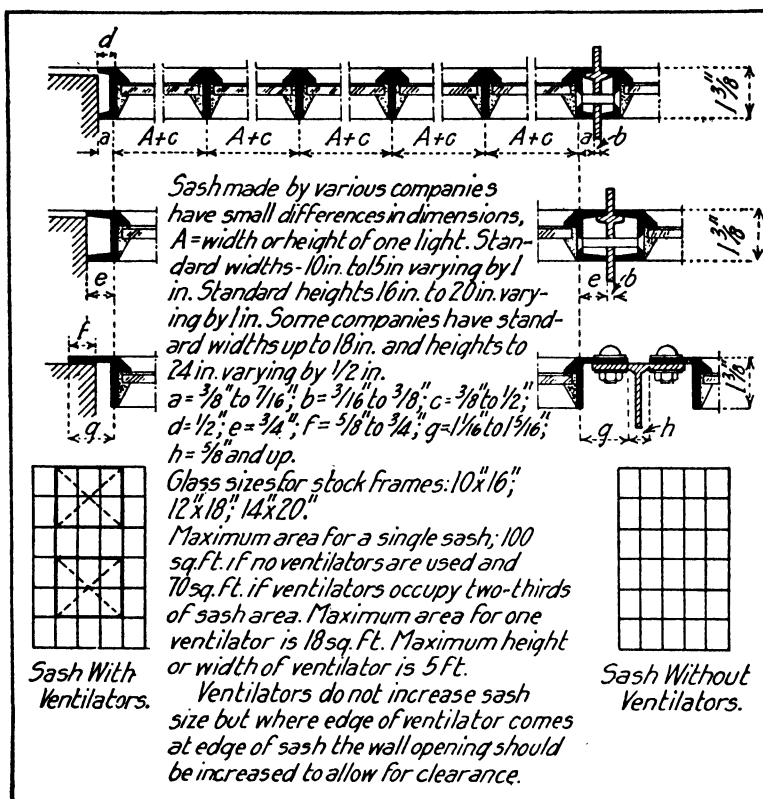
STANDARD DETAILS FOR STEEL SASH.
